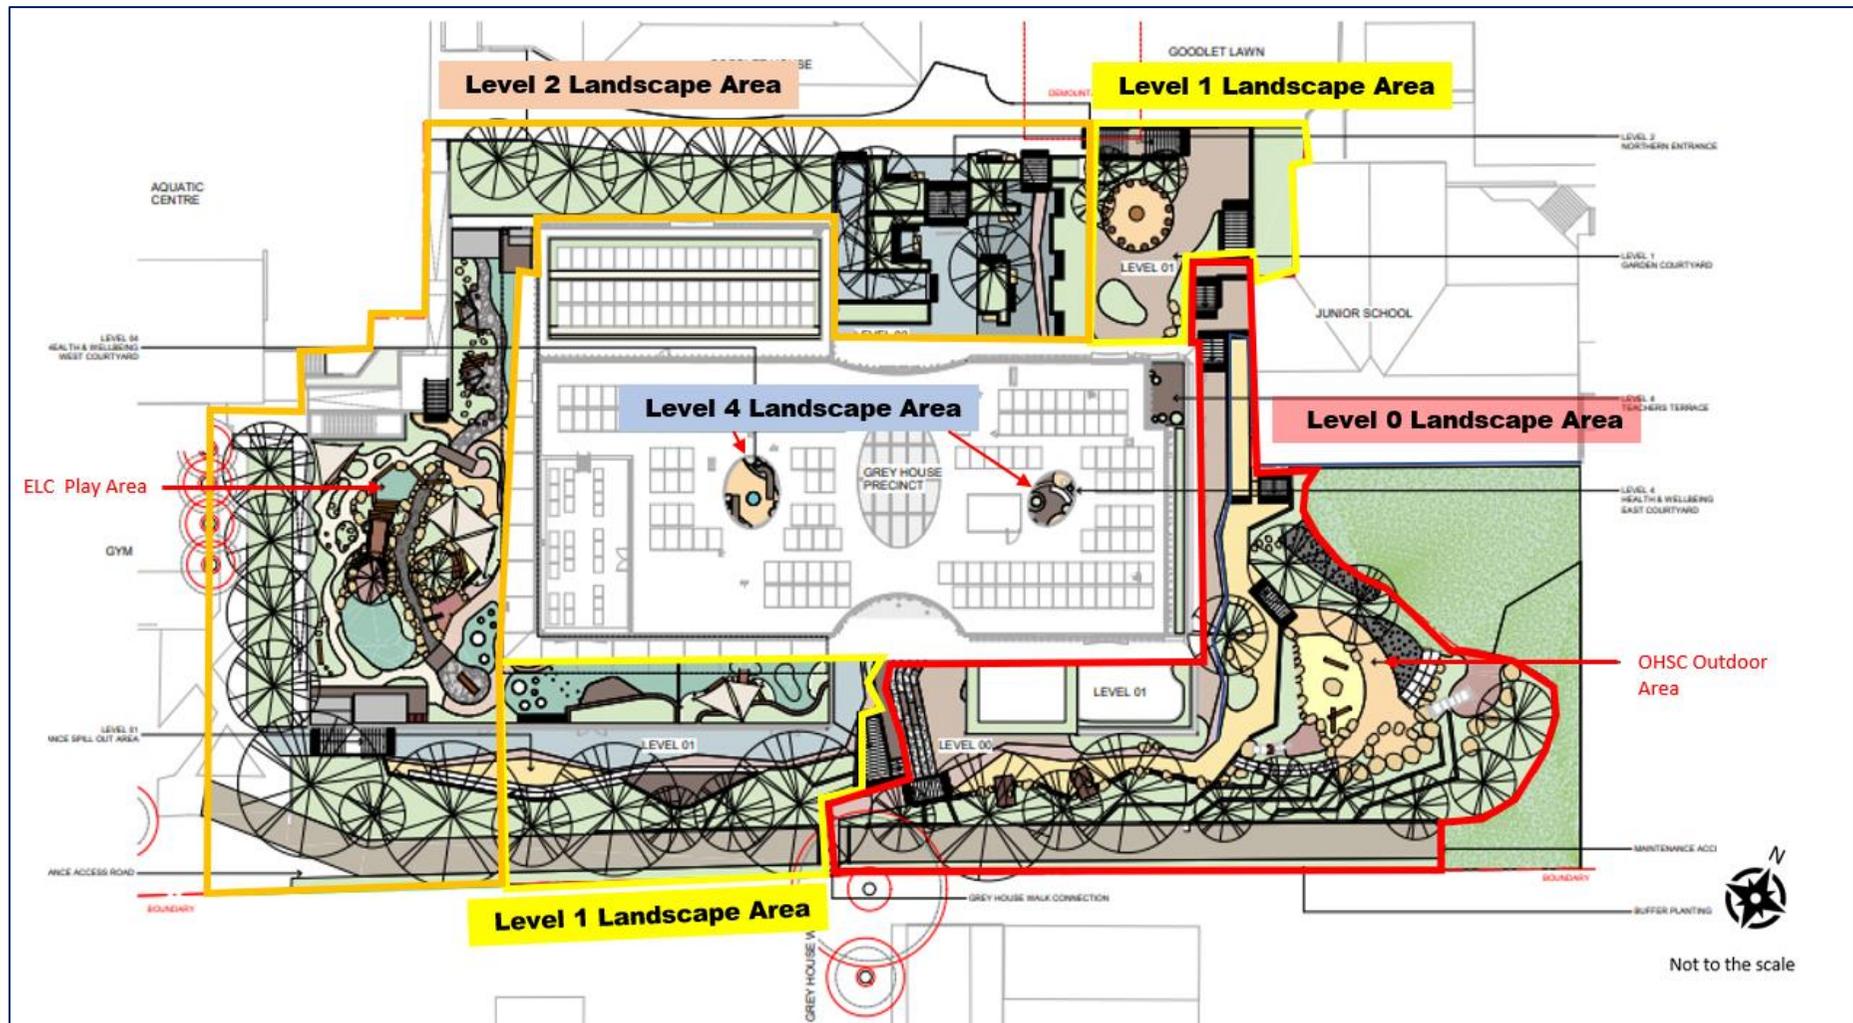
| Landscape area (Source: Applicant's RtS 2022)
